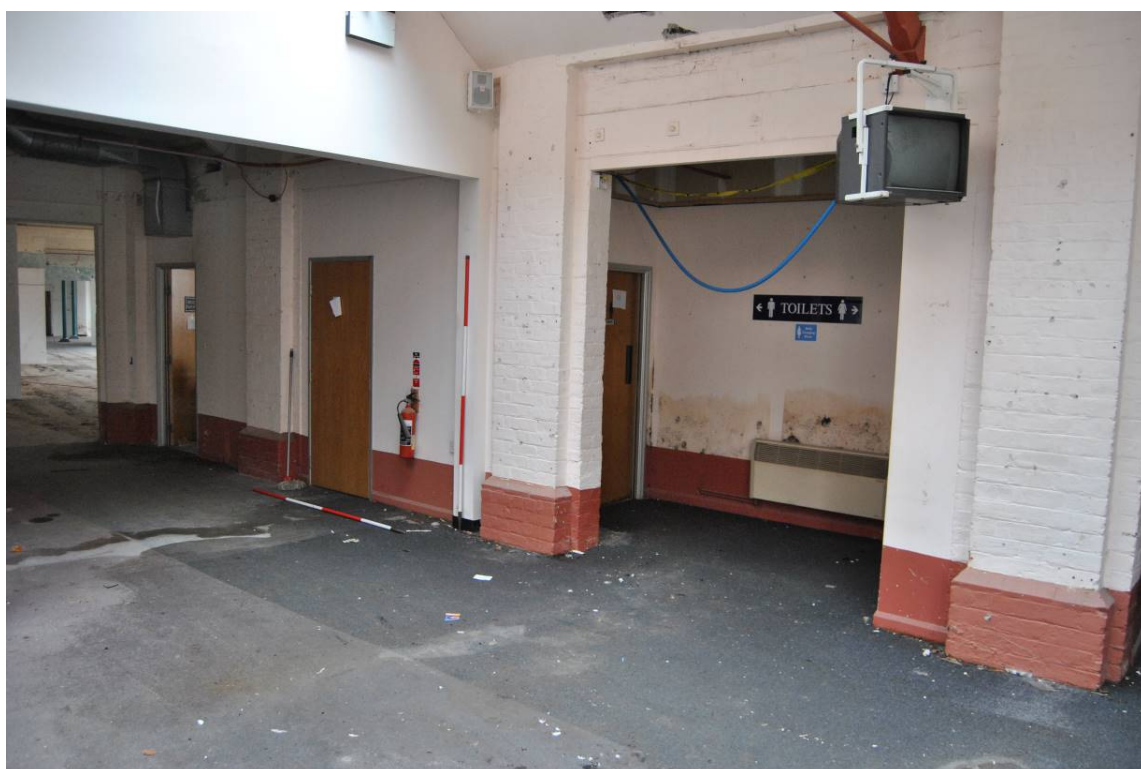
Much modified ground floor 'east' elevation of building E, infill panels removed within c.10 years of construction, 1875-9 (see Figure 61).
